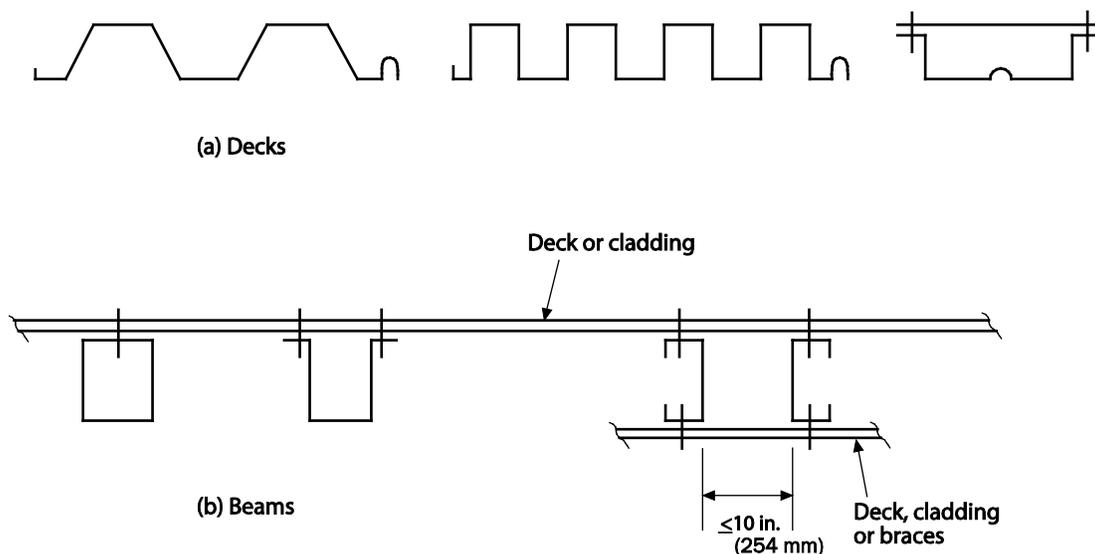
Sections Used for Exception Clause of Specification Section H3
